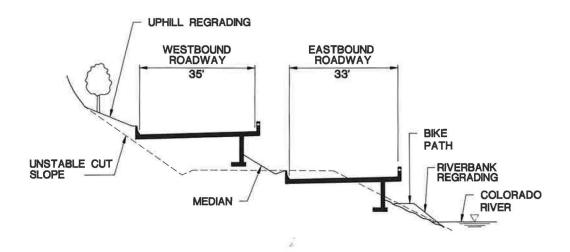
Terraced system of retaining walls with posttensioned concrete pavements permits optimum use of existing terrain.
